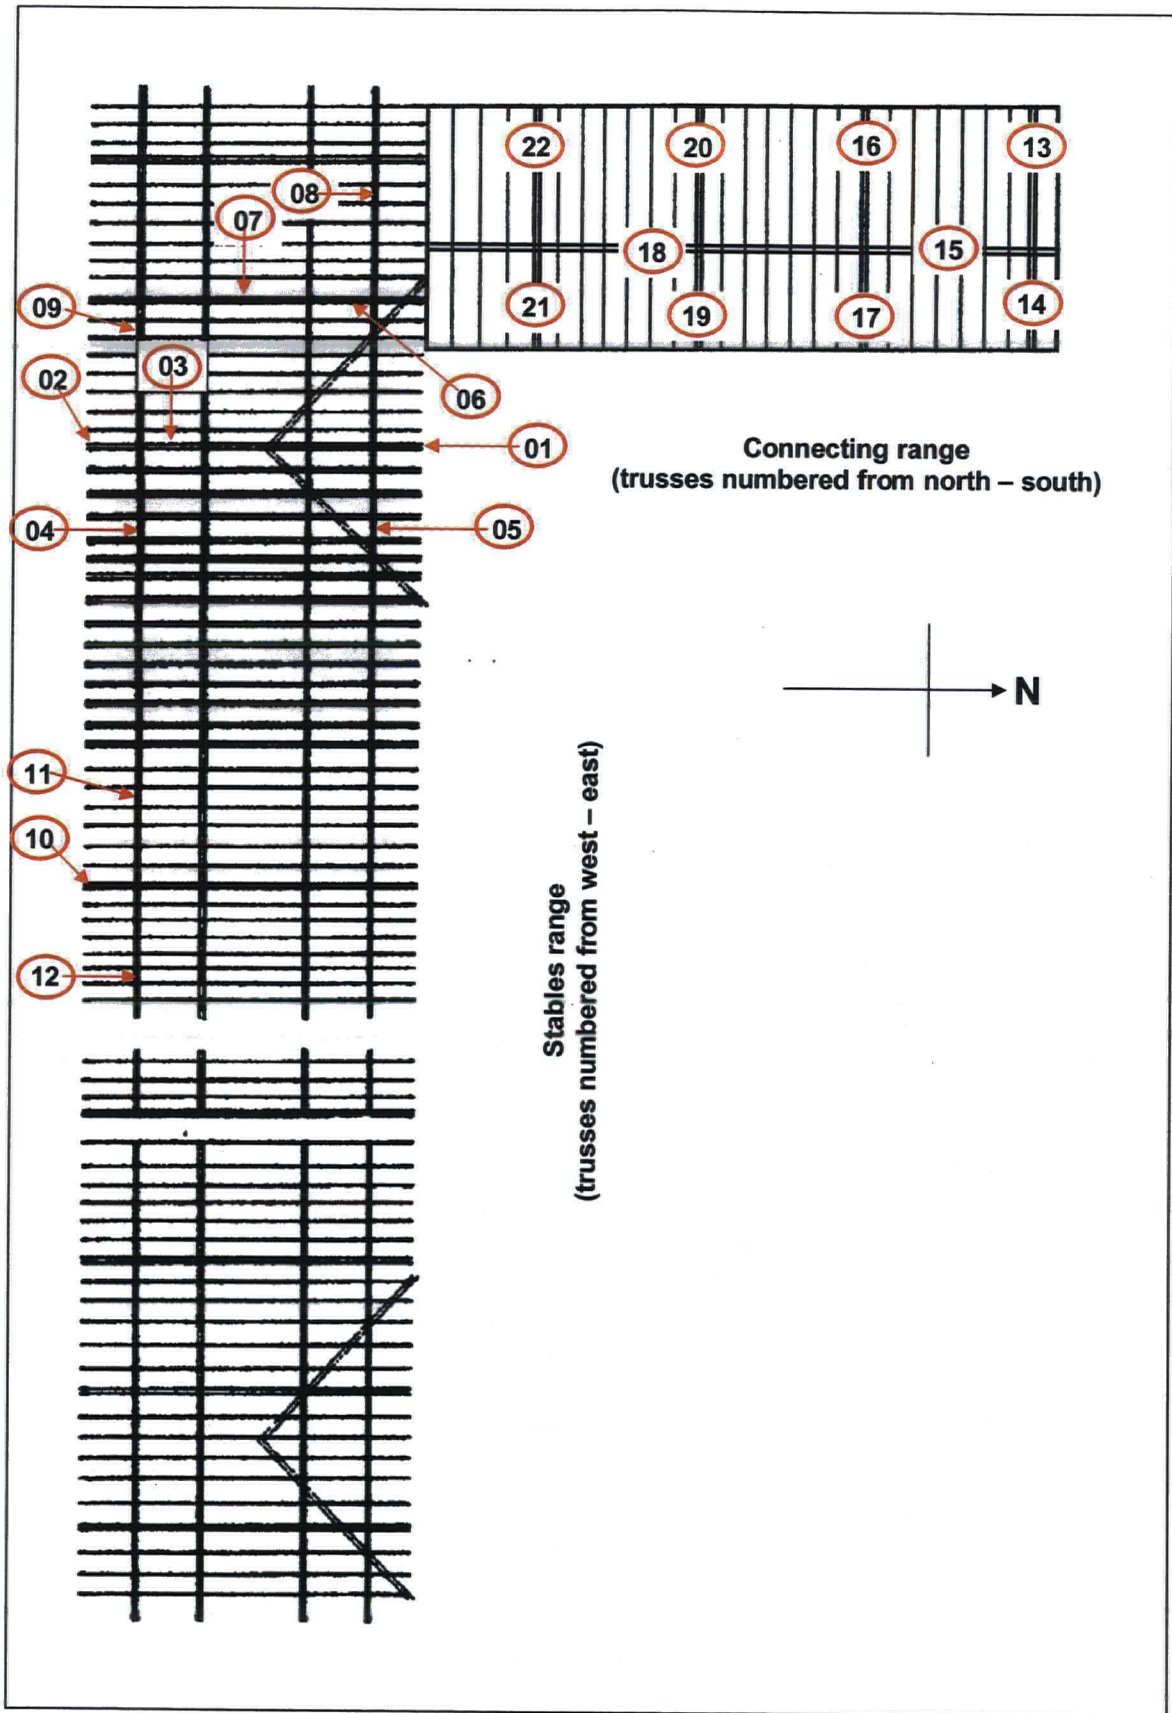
Plan to show location of samples from the roofs of the main and connecting ranges
